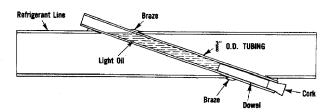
Suggested Method of Constructing Thermometer Well to Obtain Temperature Readings of Gas in Pipe Lines.
